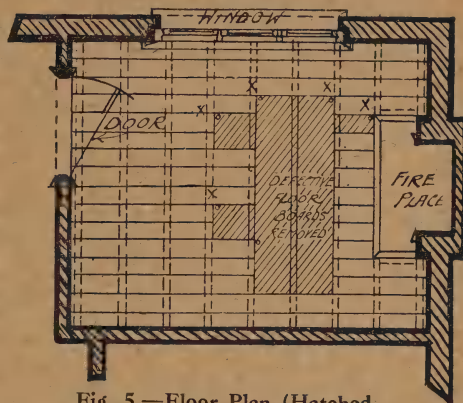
Floor Plan (Hatched Lines Show Defective Part to be Replaced)
